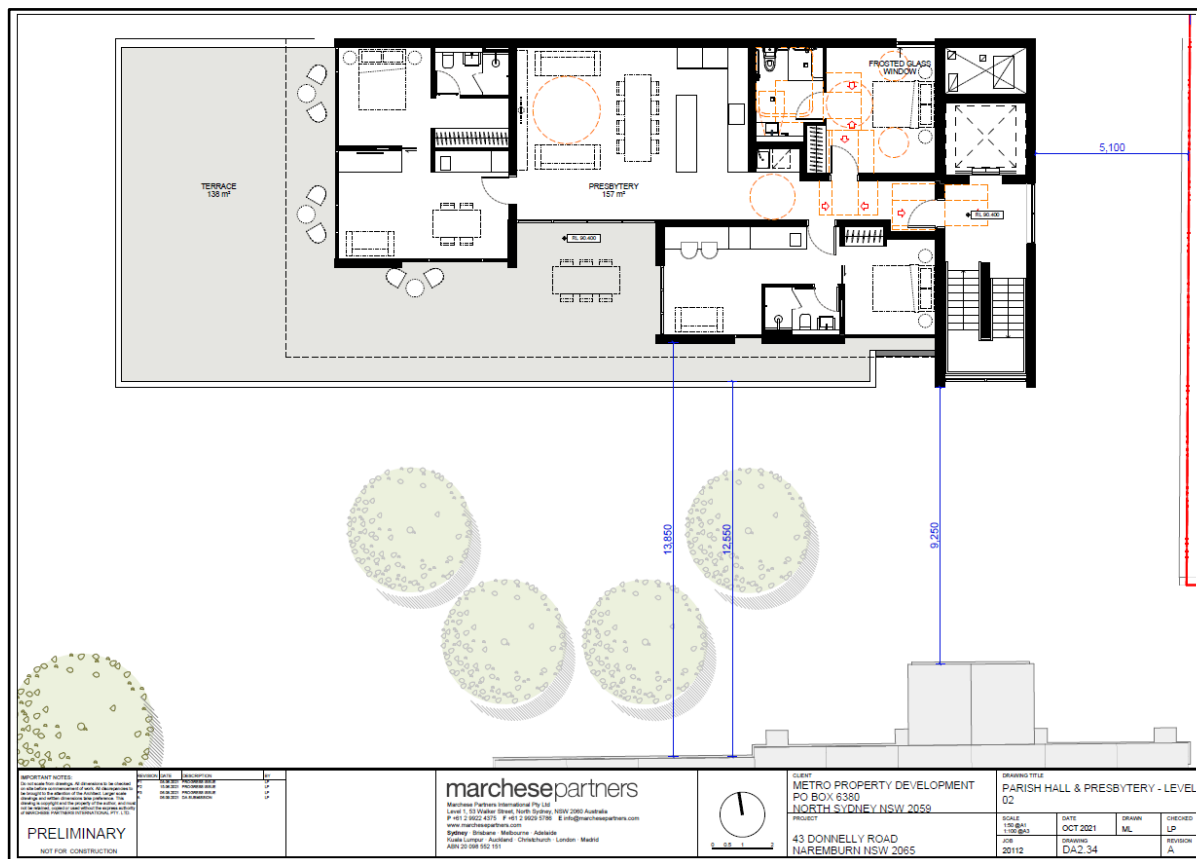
Proposed Level 02 plan of the new parish hall and presbytery.
